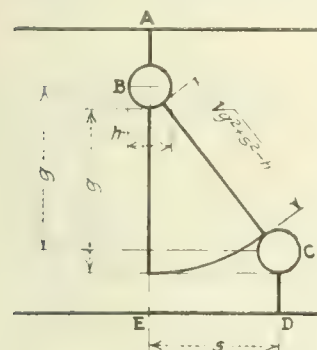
MINIMUM STAGGER OF RIVET HOLES
